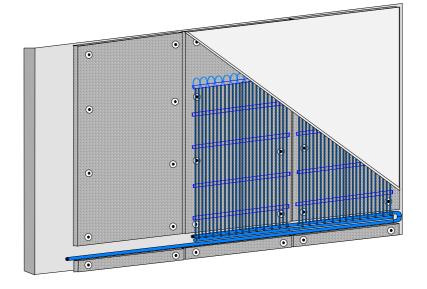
Arrangement of the collector pipes and piping according to "Tichelmann" by utilisation of insulation sheets for the formation of installation slots.
